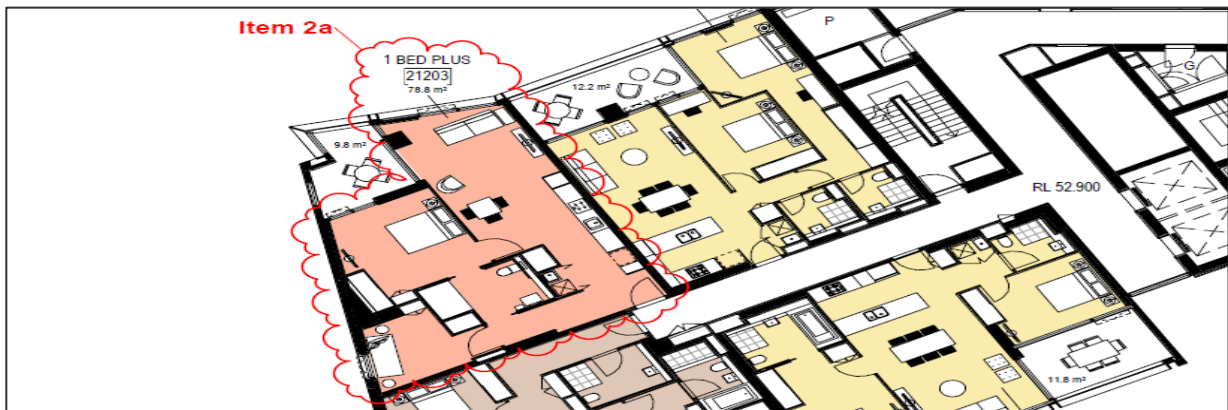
| Proposed layout of 1 bedroom and study apartment on Level 12 of Building 2 (Item 2a) (Source: Applicant)
